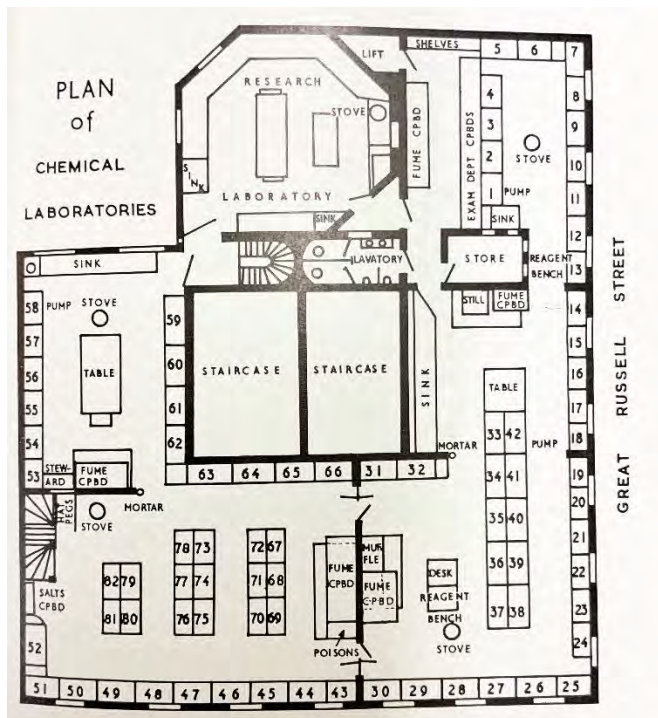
Third floor plan showing the open plan layout, as arranged in 1904. The Octagonal room was extended to this storey during the 1859 extension, and the area over the dual staircases was expressed as a void.
